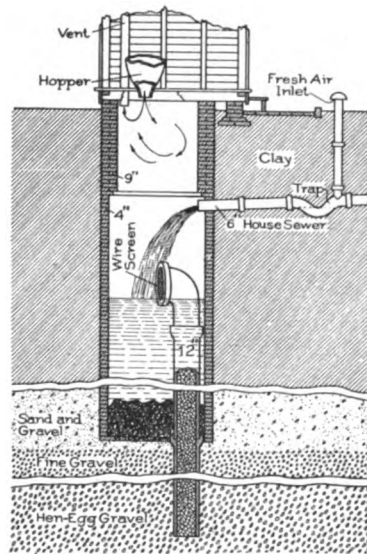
Sectional Elevation of Dry-and-Wet Well.
